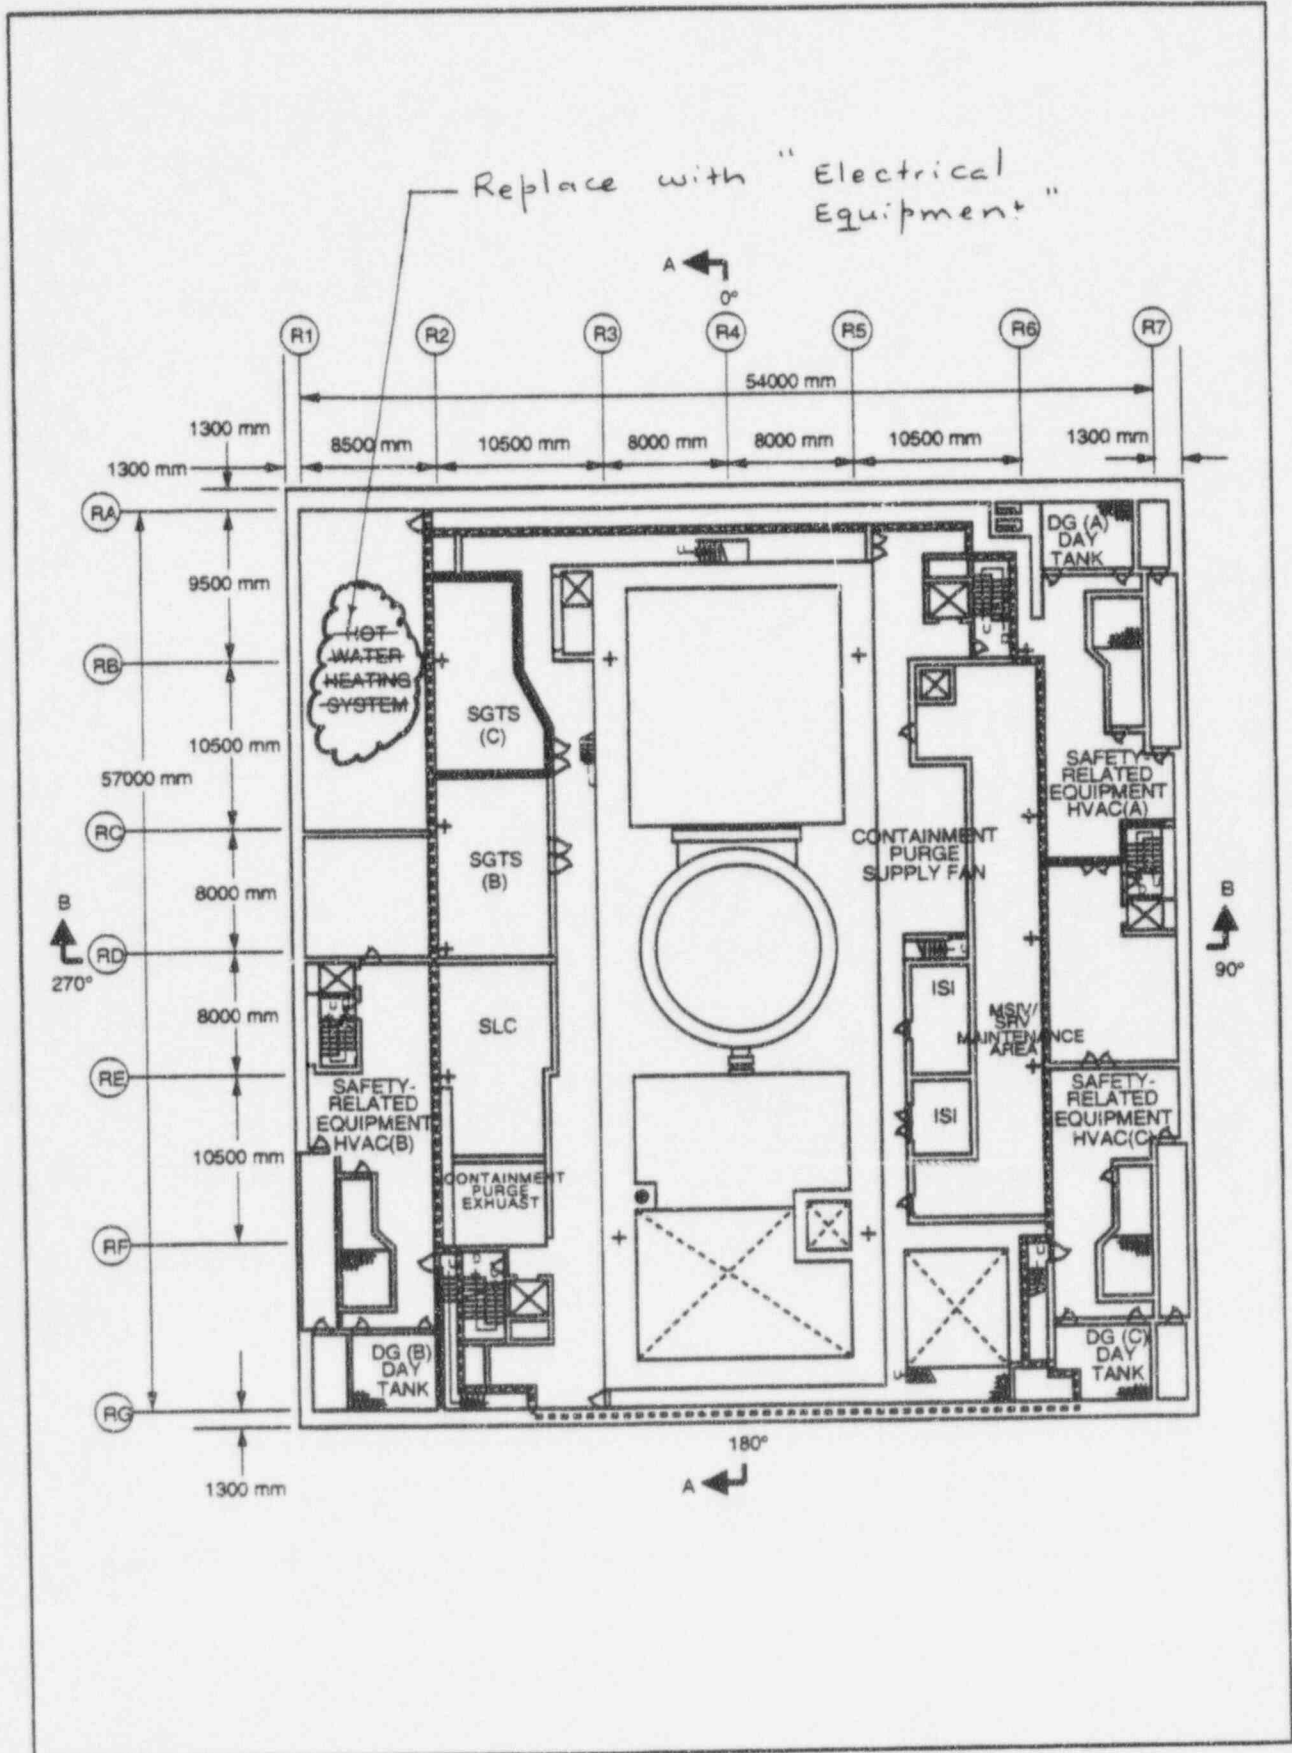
I Reactor Building Arrangement, Floor 3F—Elevation 23500 mm
